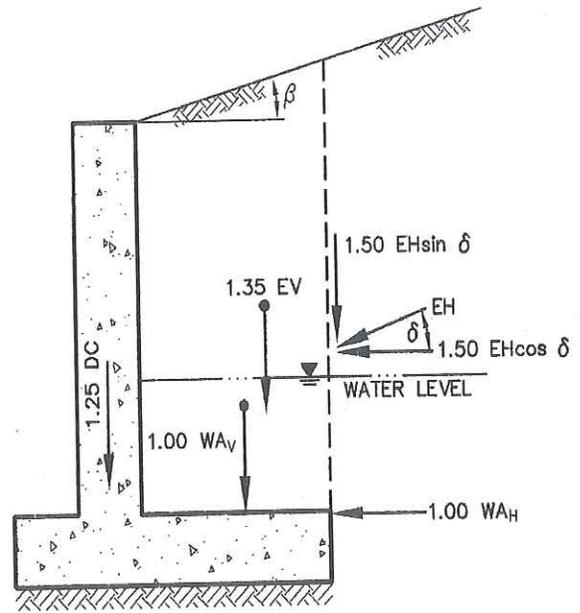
Typical Application of Load Factors for Bearing Resistance
